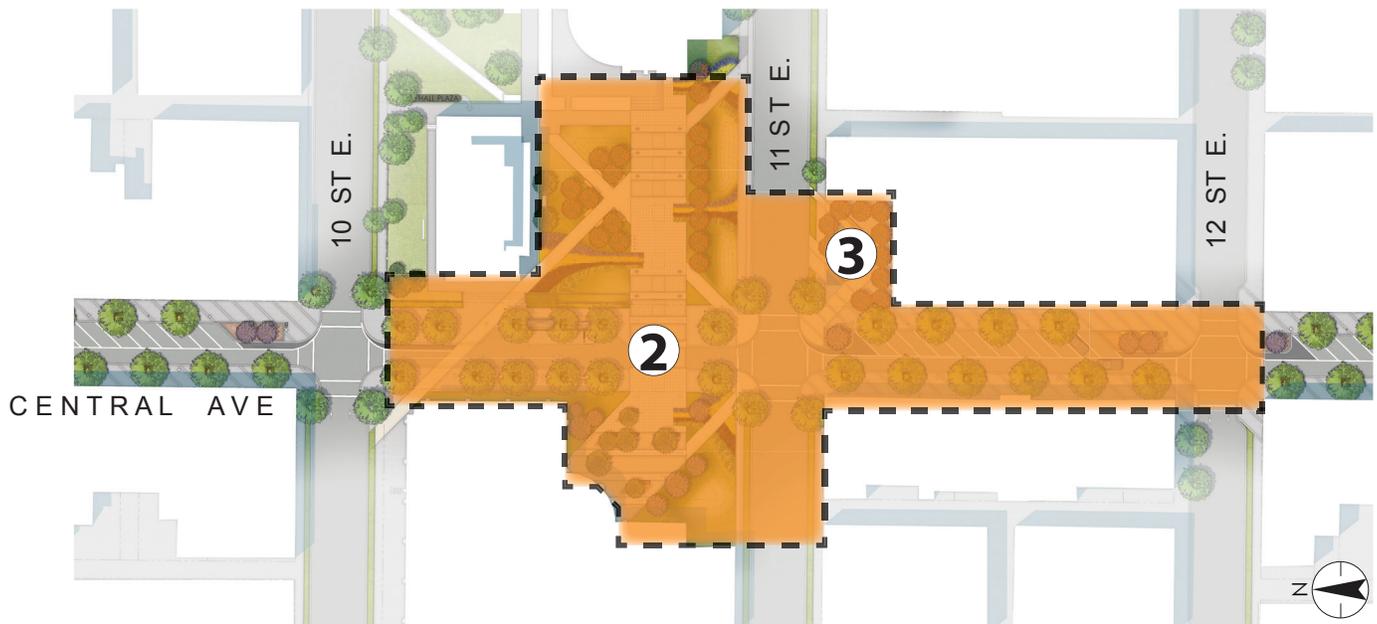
Central Avenue Construction Phase 2 Plan
